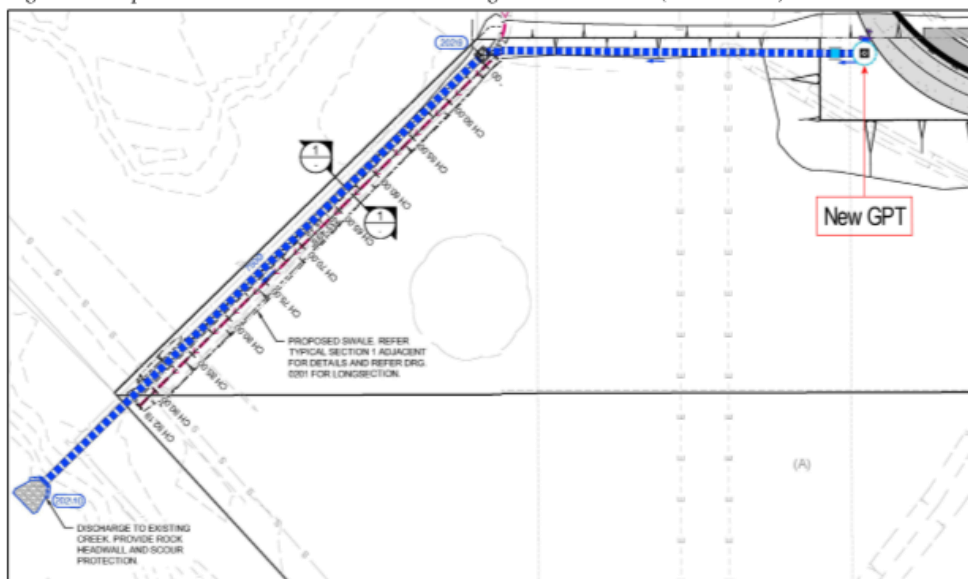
Proposed Stormwater outlet 2 and GPT along Eleventh Avenue (Colliers 2023)
